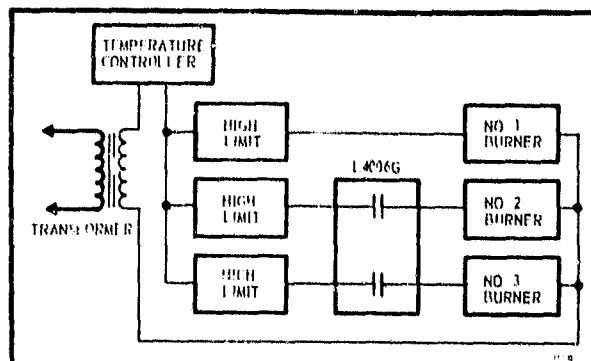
TYPICAL HOOKUP FOR L4006G BOILER SEQUENCING AQUASTAT.
